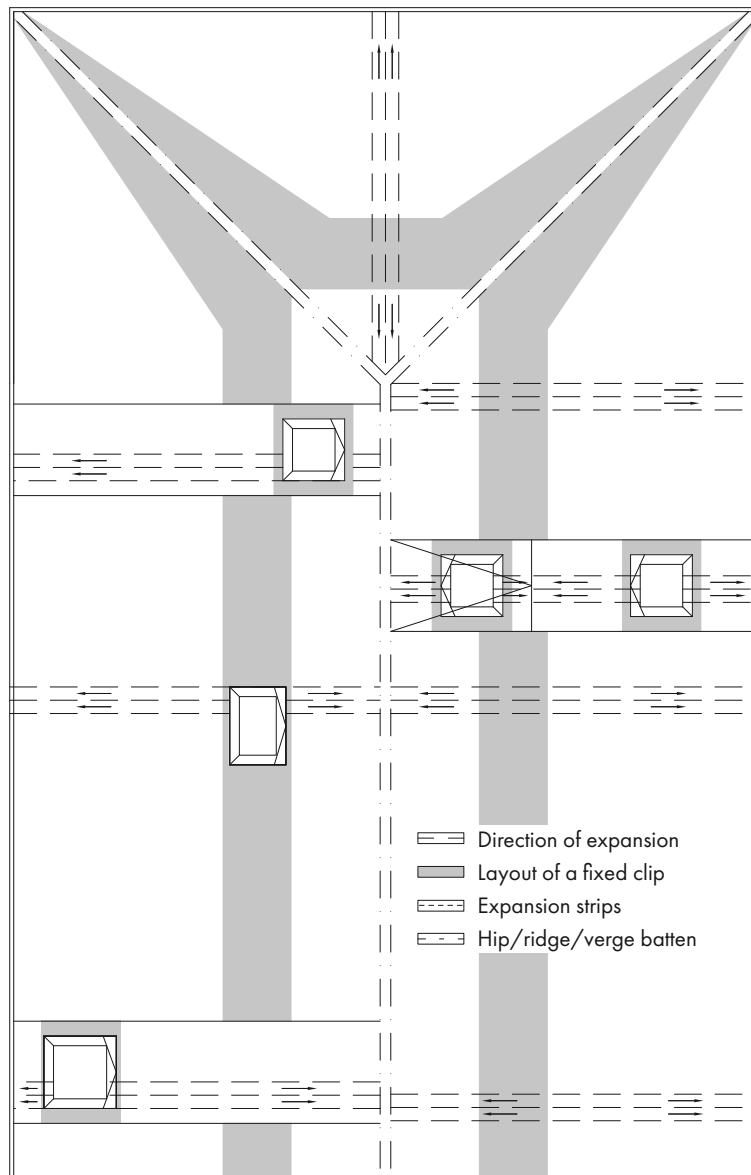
Fixed clip area for a hip roof with a 9° pitch, section width of 16 m, with expansion strips and roof penetrations (example). For roof penetrations of ≥ 3.0 m, expansion strips should be installed on the sides and in the middle of the penetration, so that lateral and linear expansion at the assemblage points of the seam can be better accommodated.
